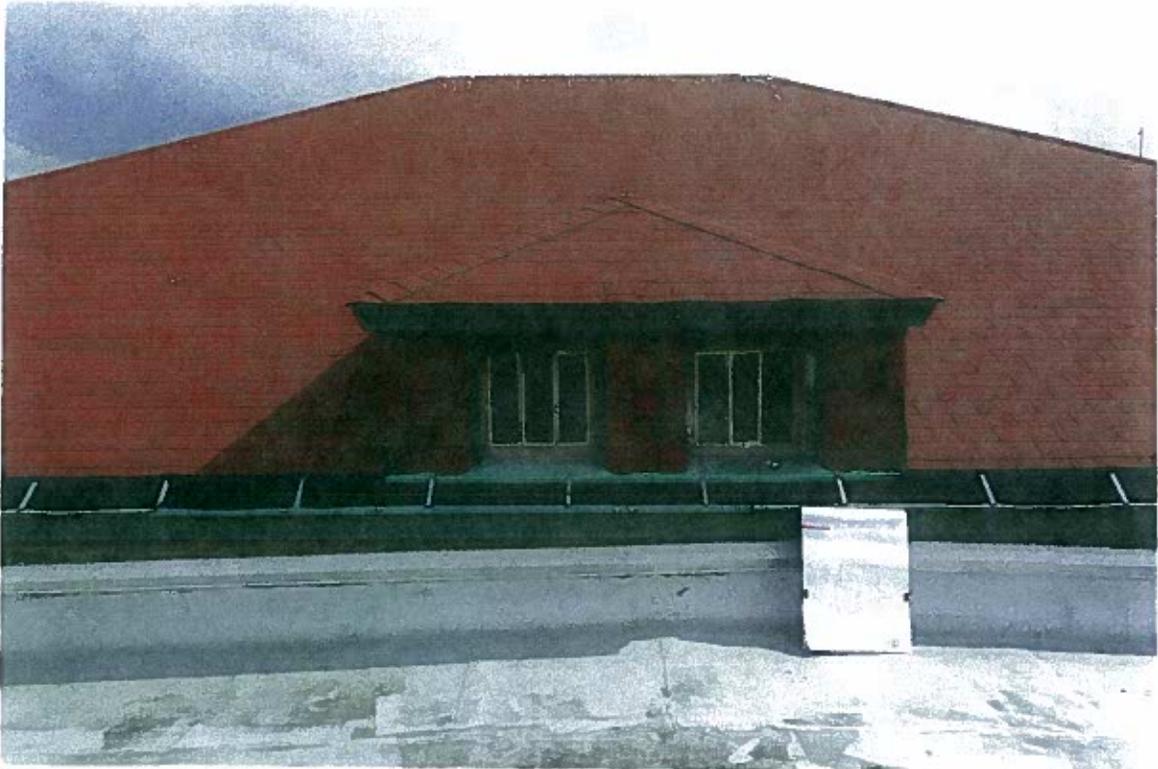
Windows at the center dormer are missing glass, allowing rain, birds and other animals to enter the building.
